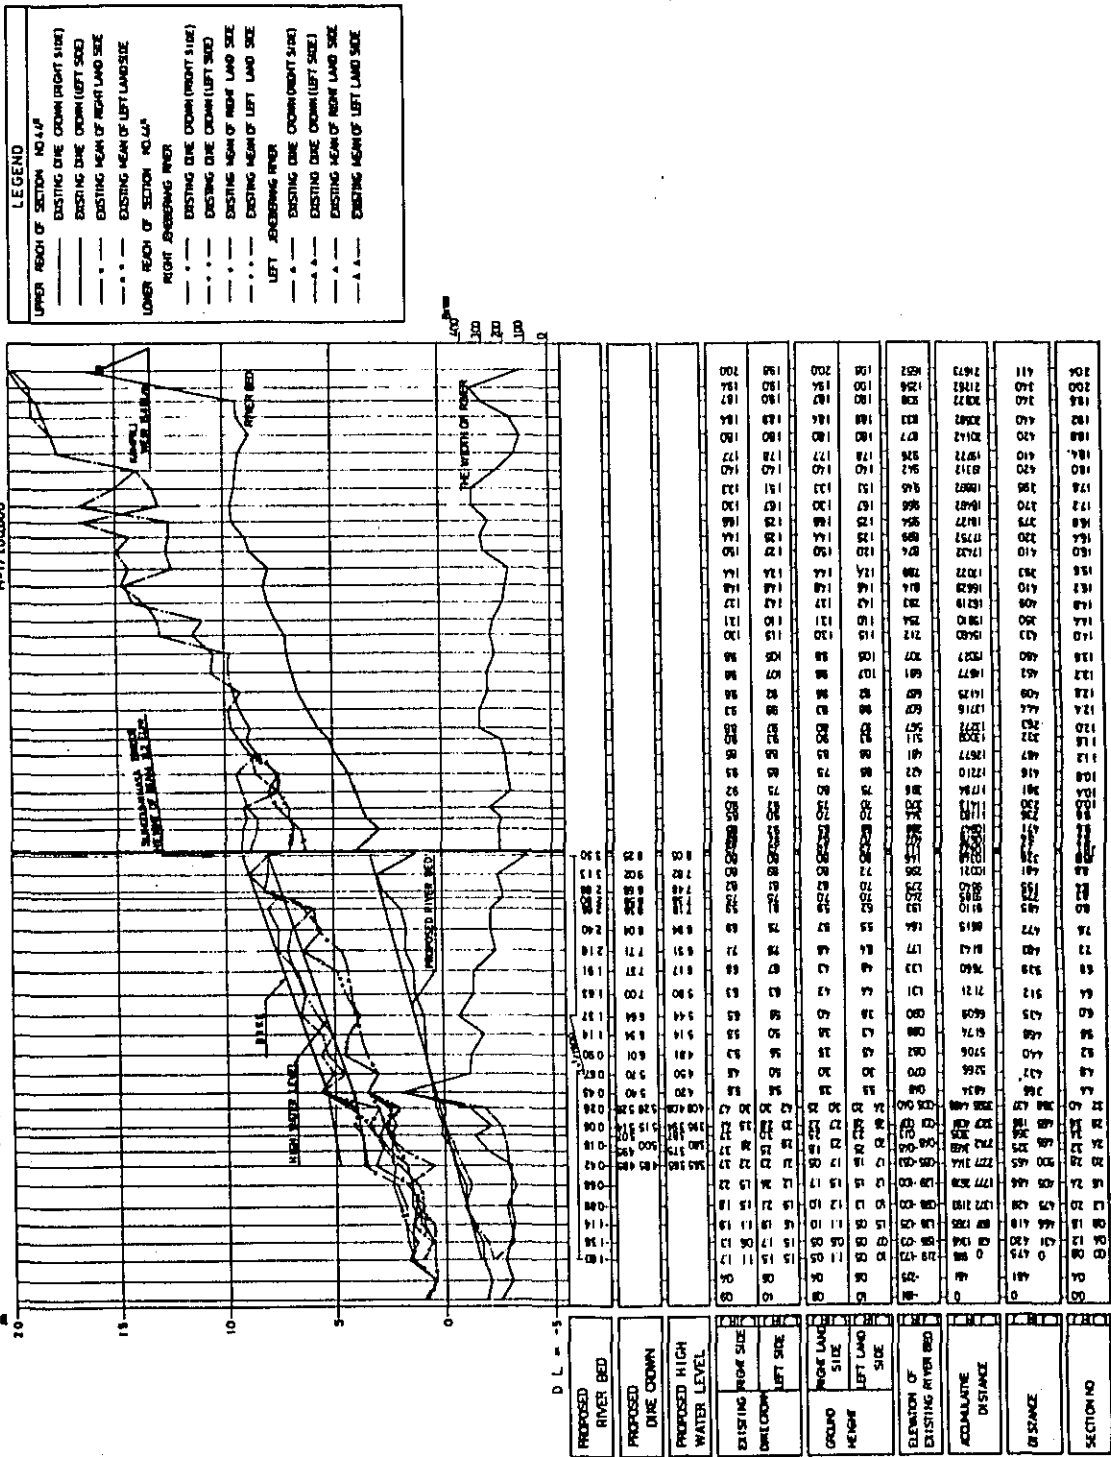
PROPOSED ALIGNMENT FOR URGENT PLAN
